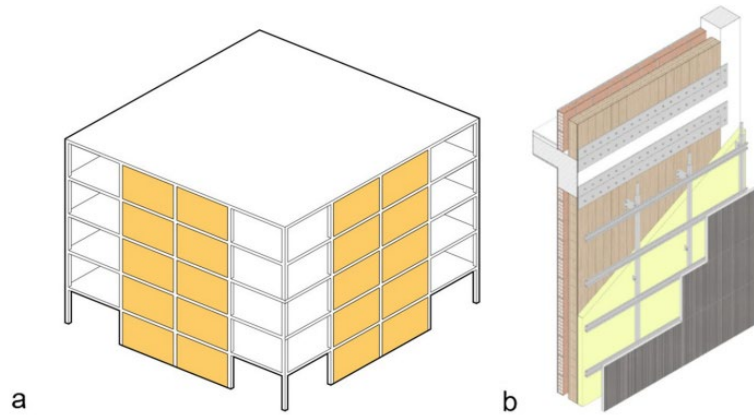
16, CLT panels used as infill shear walls for RC buildings retrofit.
